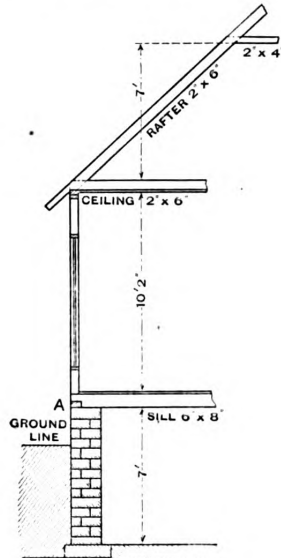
Sectional View of Framing and Foundation.—Scale, $\frac{1}{8}$ Inch to the Foot.
